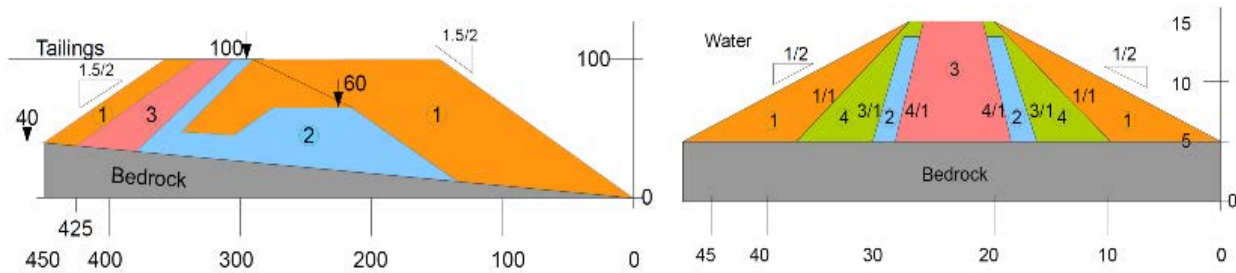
(Left) Dam 1A cross section: Raise at altitude 100 m of Dam 1 (final height 162 m). (Right) Cross-section of Dam 2, a water retention dam
